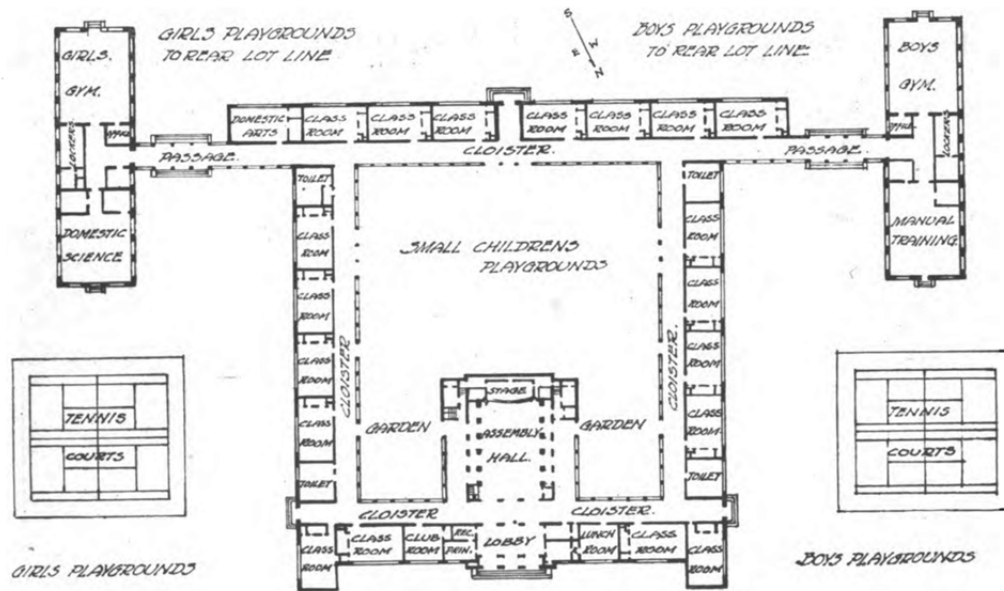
GROUND FLOOR PLAN, LOCKWOOD SCHOOL, OAKLAND, CALIFORNIA
